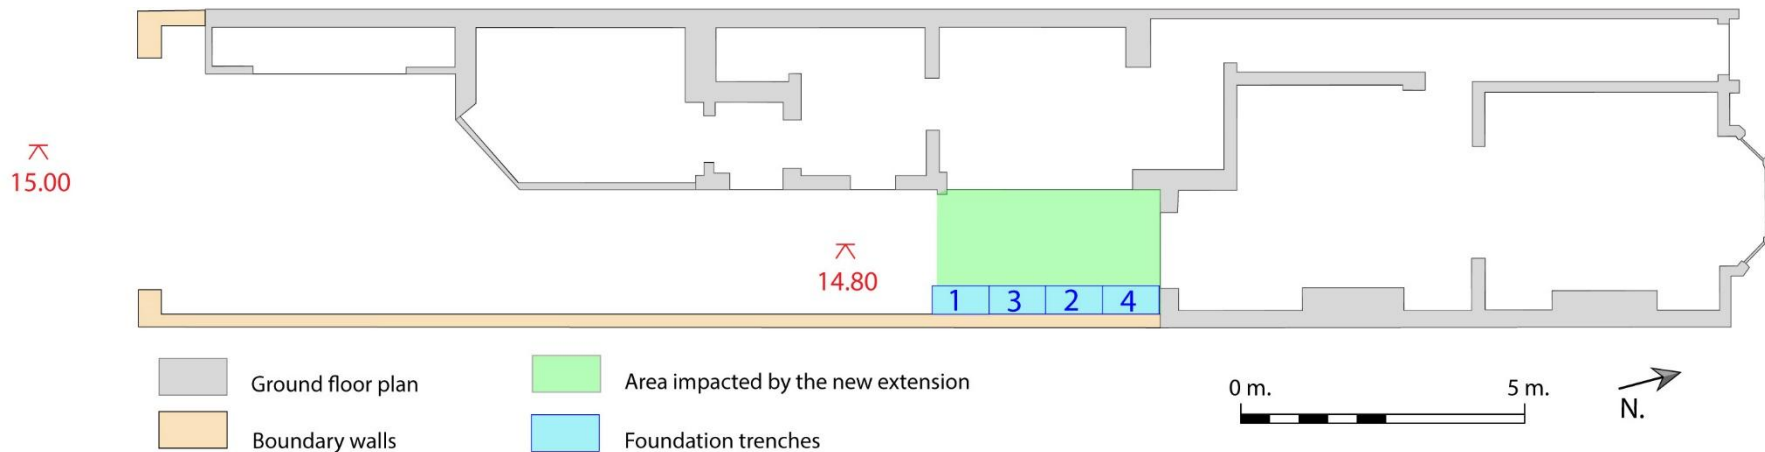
Plan of the ground floor of Claremont Terrace with the underpinning foundation trenches indicated (1-4)
